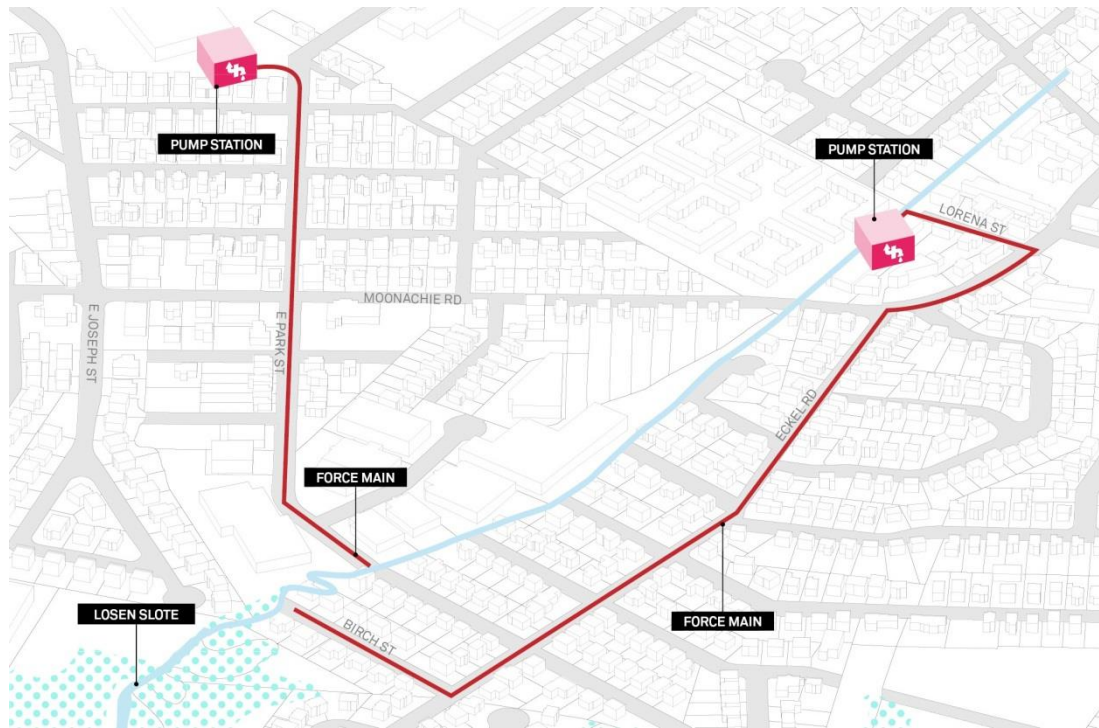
Concept Drawing of Proposed Improvements to East Riser Ditch
